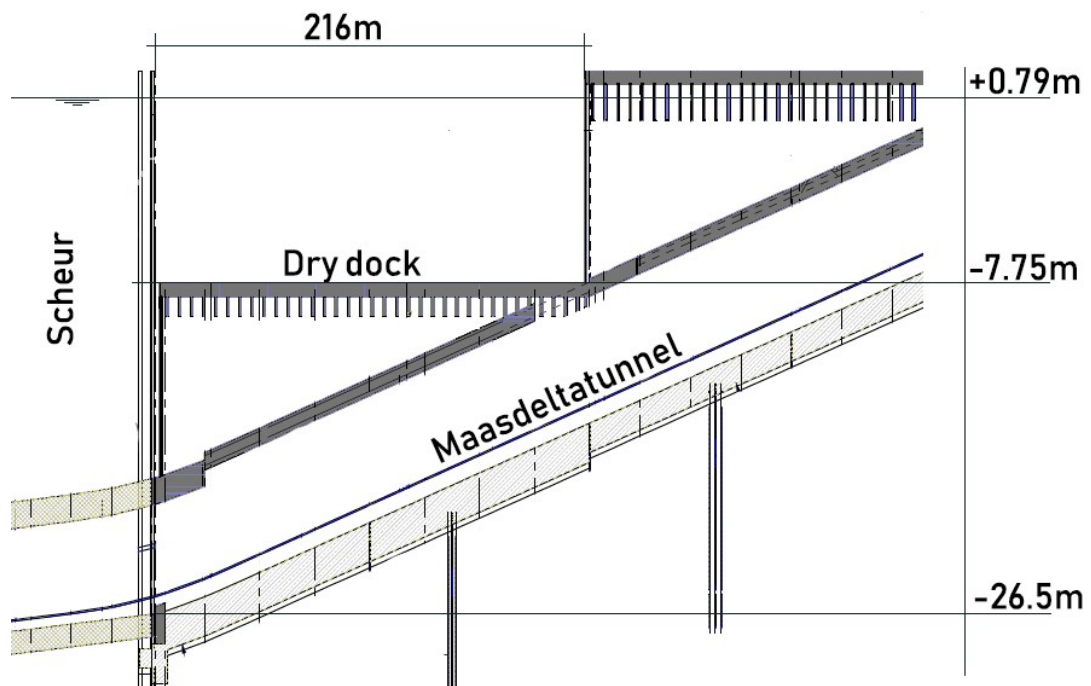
Construction principle of the Maasdeltatunnel with a dry dock constructed inside the construction pit (North side). Figure adapted from BAAK and not to scale.
